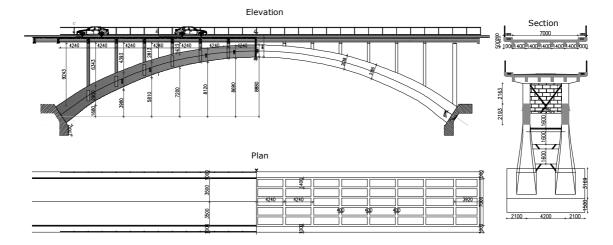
S.Giustina bridge: plan, elevation and cross-sections.
